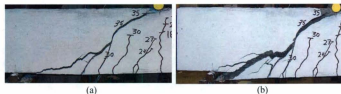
Failure mechanism of beam G-50; (a) crack width before failure and (b) crack width after failure
